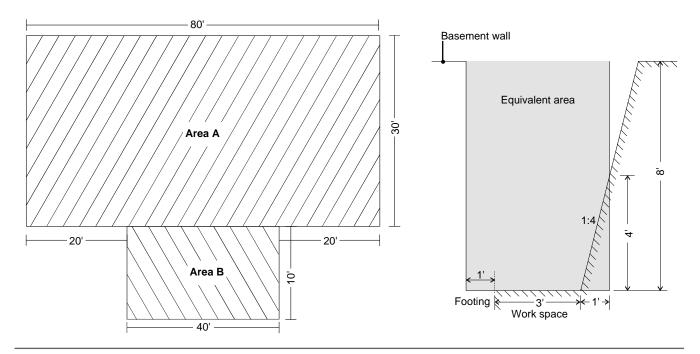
Calculating the volume of a sloping wall basement excavation
